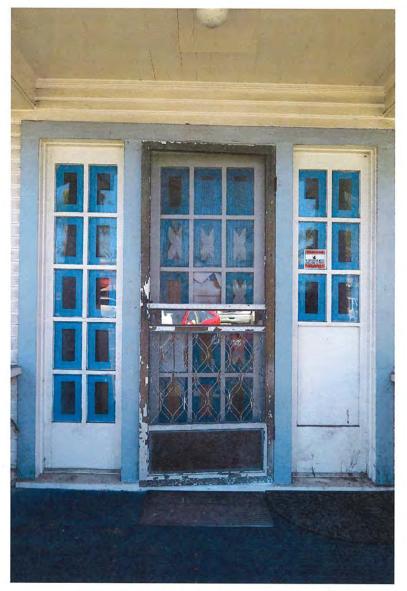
Close-up of the original, framed front door and windows on the north façade.
